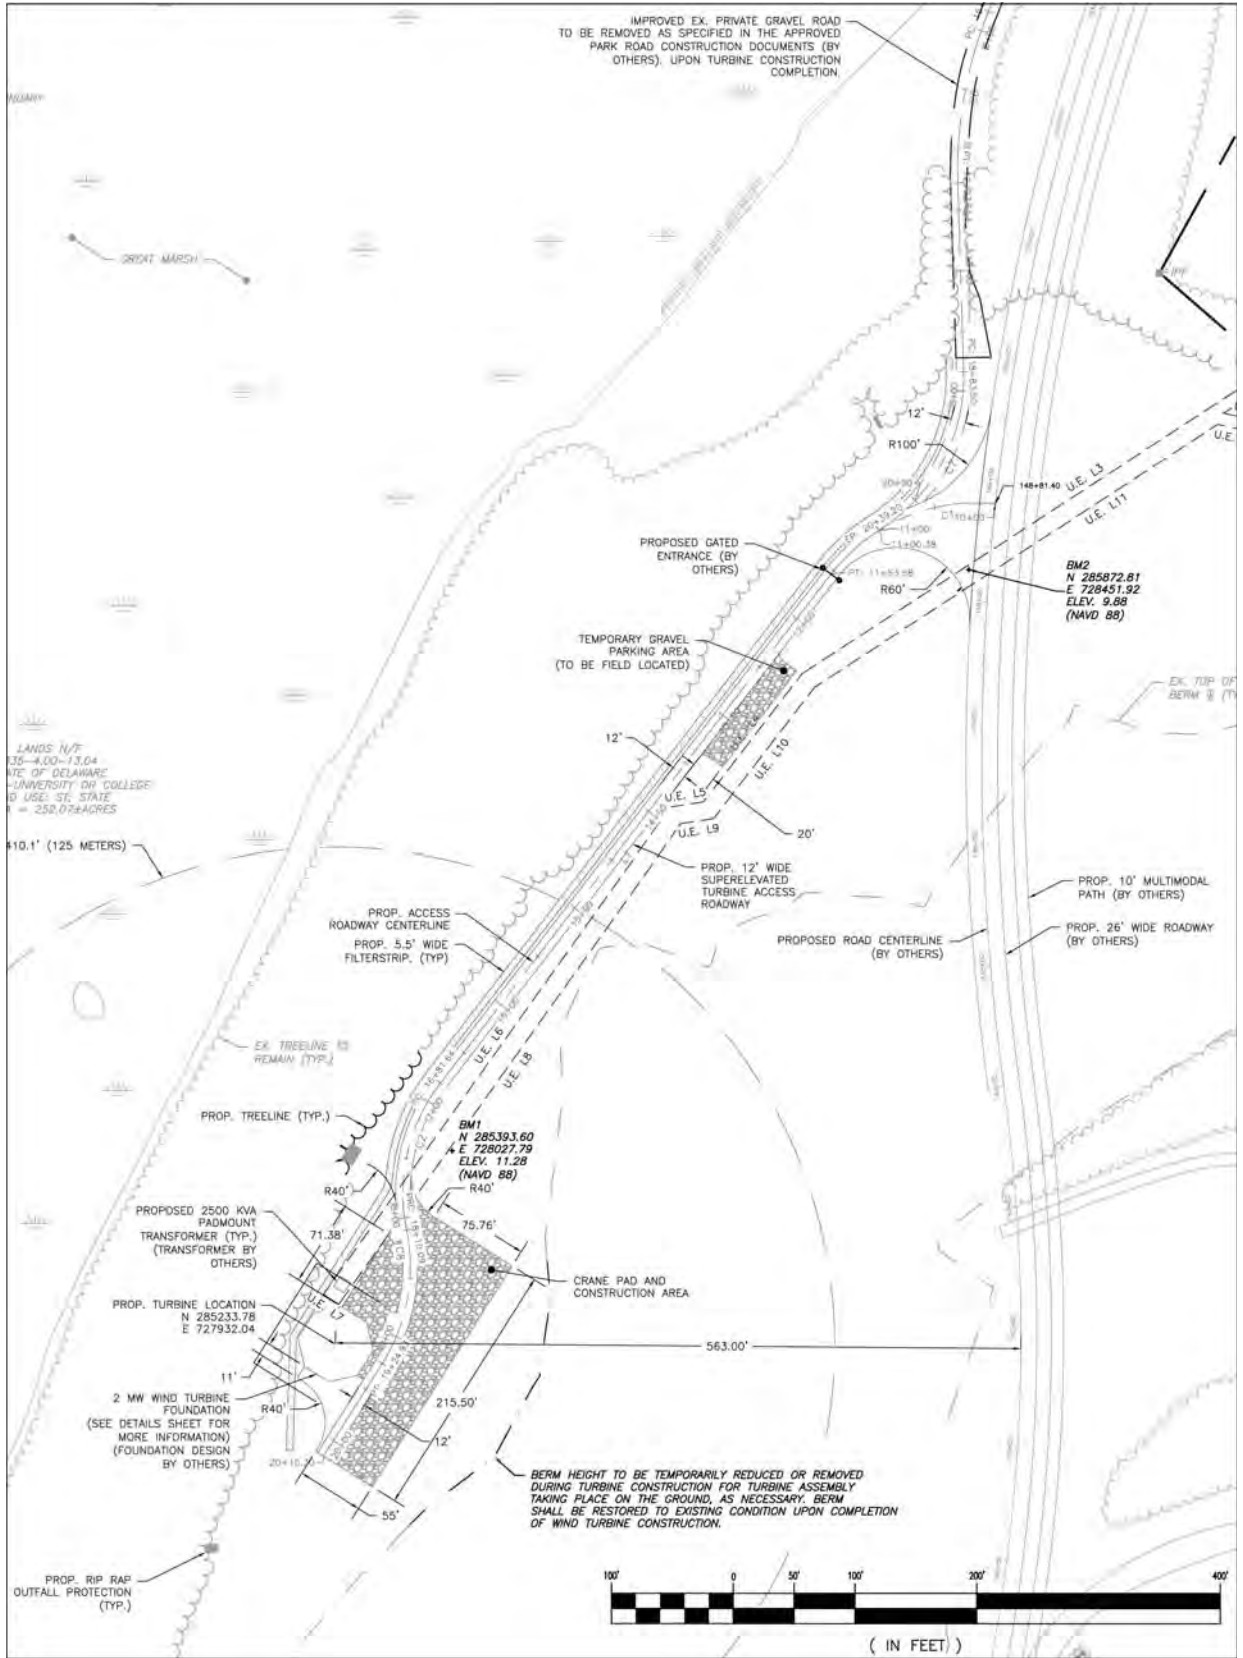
Portion of Preliminary Site Plan showing layout of wind turbine location.
